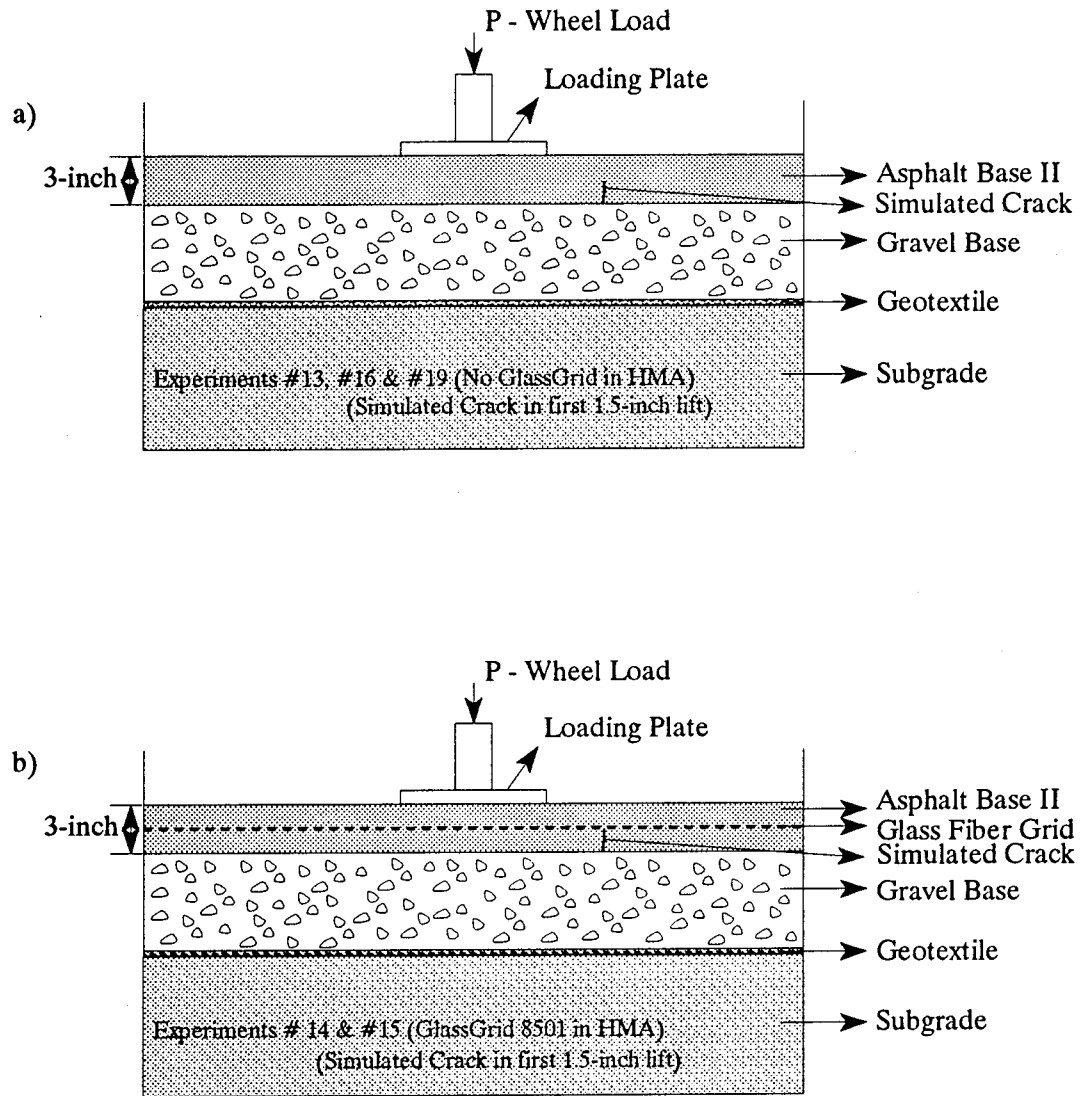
Experimental Outline for Pavement Section with a Simulated Crack
